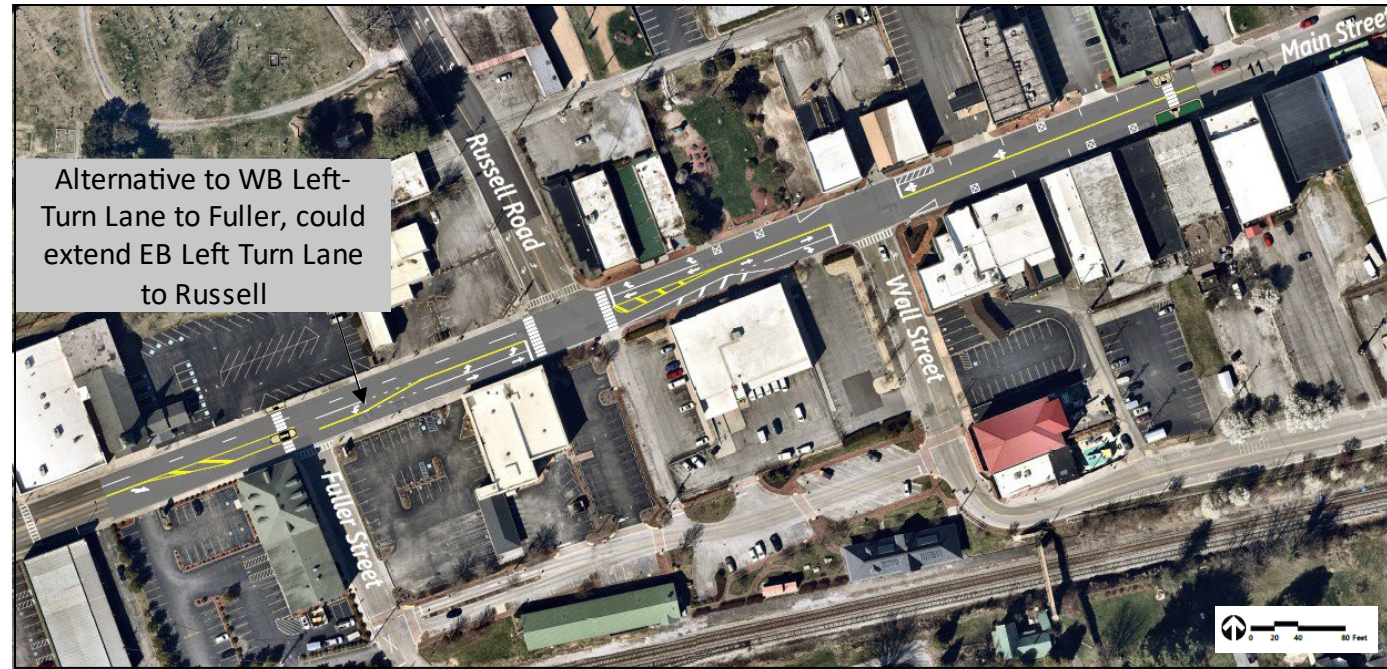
Fuller Street to Wall Street Reconfiguration Concept
